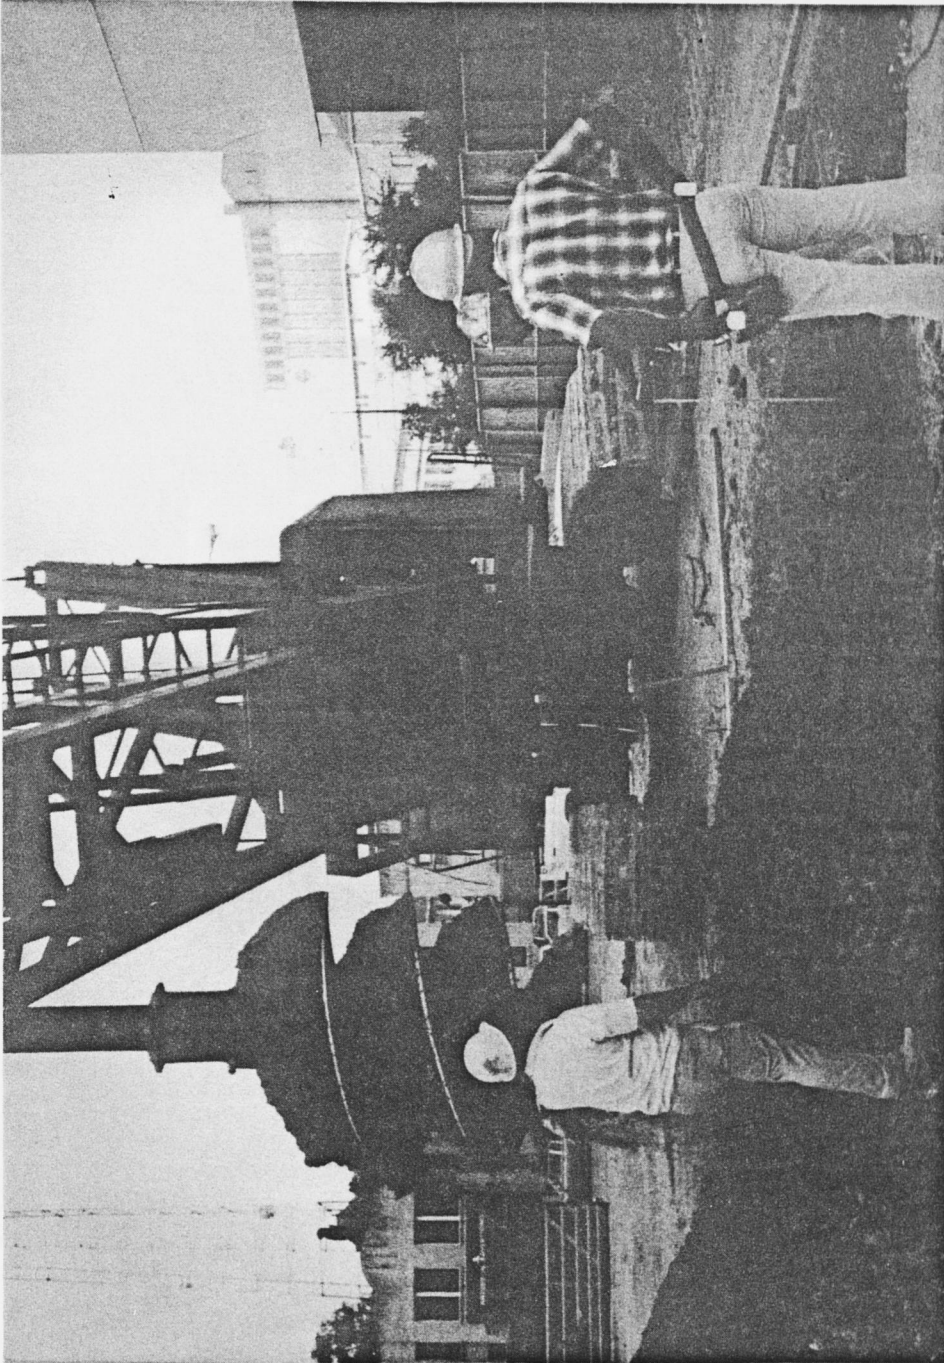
PIER DRILLING AUGER SHOWING RELATIVE SIZE OF SHAFT
